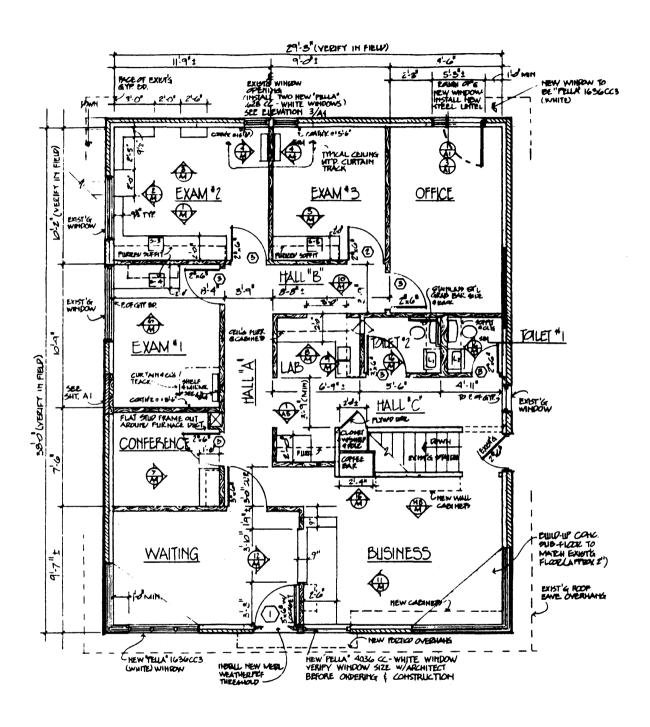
Construction Drawing With Annotations Including Room Labels, Dimensions, Architectural and Design Features, and Construction Notes (Kilmer & Kilmer, 1992, p. 555).
